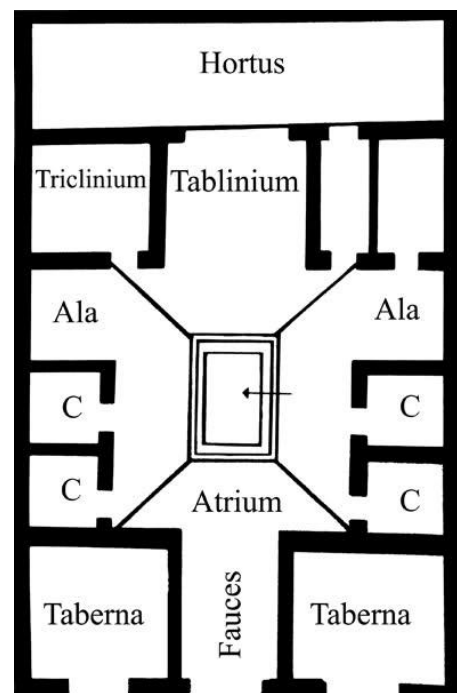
Example of a Vitruvian Atrium House. Taberna: Small Shop, Fauces: Entrance Hallway, C: Cubiculum (Small room/Bedroom), Ala: Atrium Wing, Hortus: Garden.
